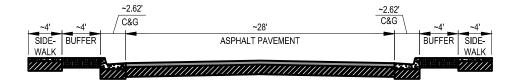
EXISTING JANE STREET TYPICAL SECTION
